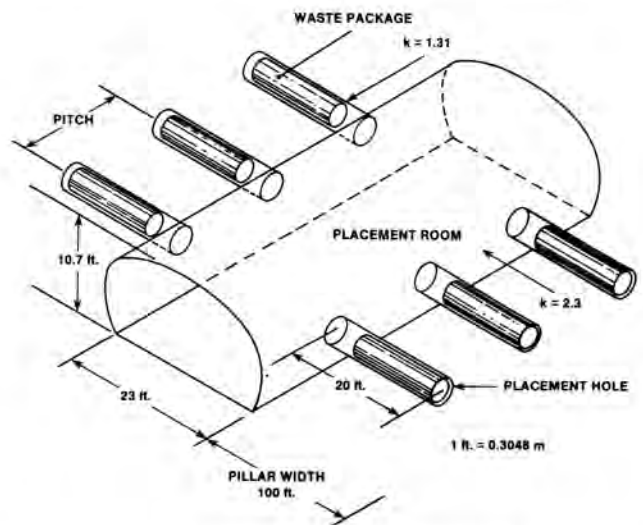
Typical Emplacement Room Proposed at Basalt.
